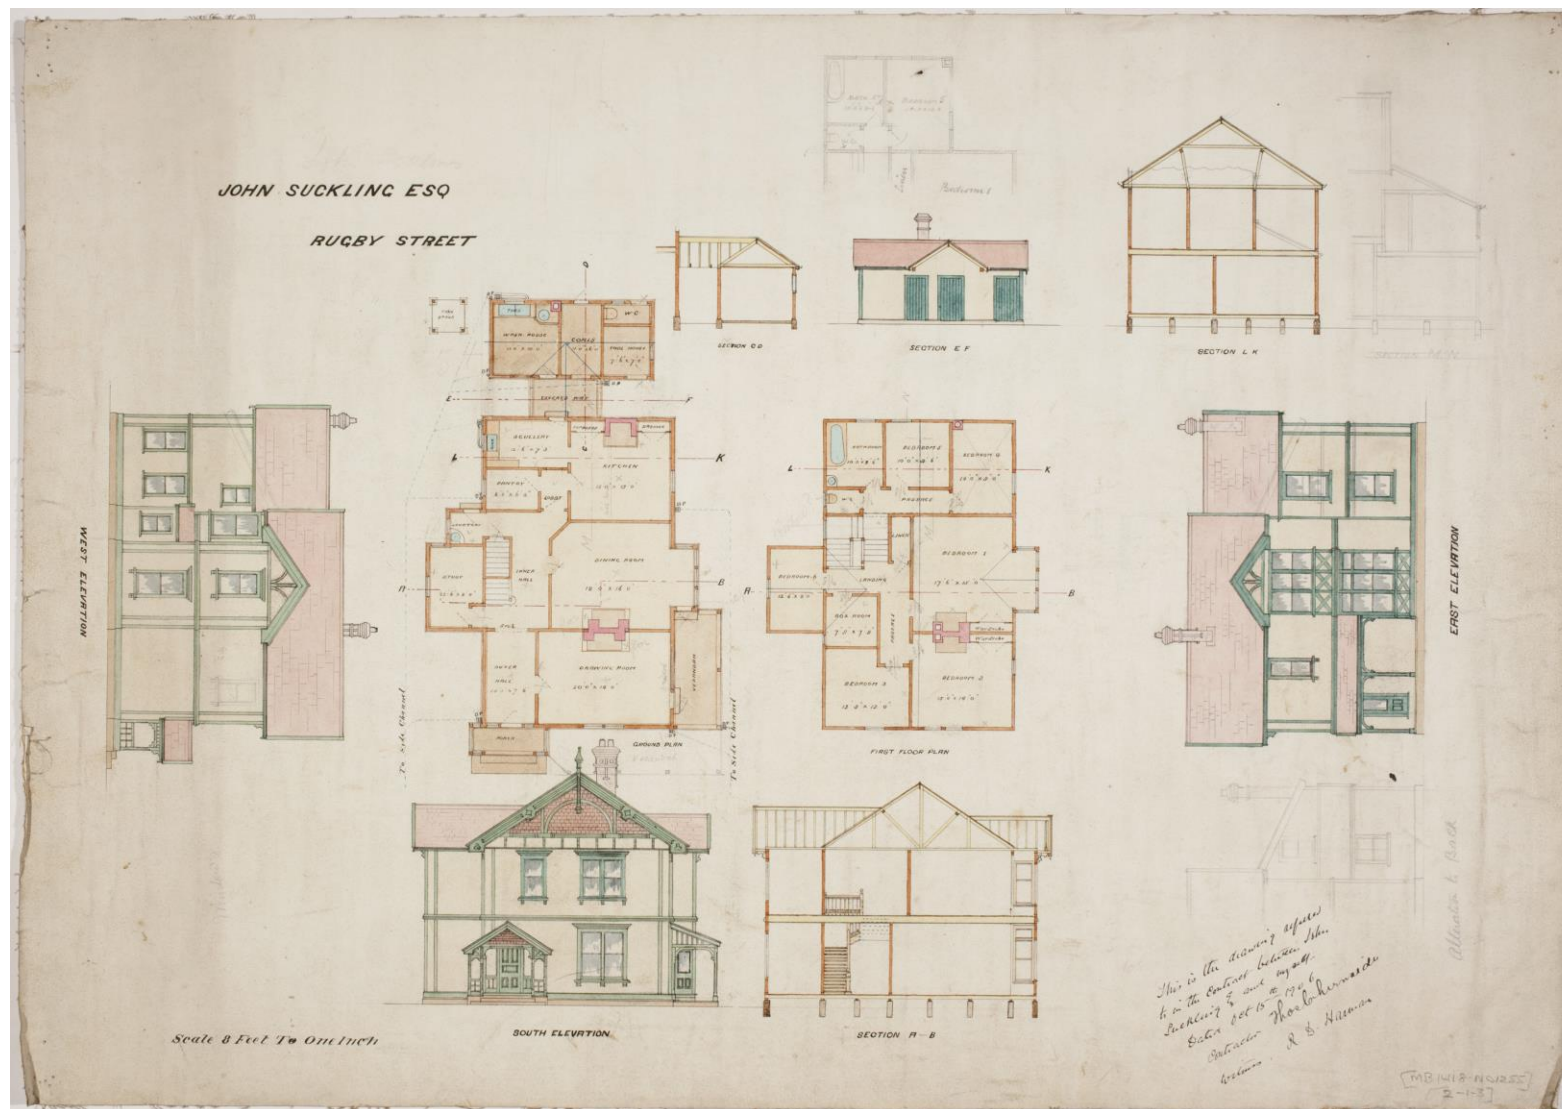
Collins and Harman, John Suckling, Esq., Rugby Street, plans, elevations and sections (1906).
